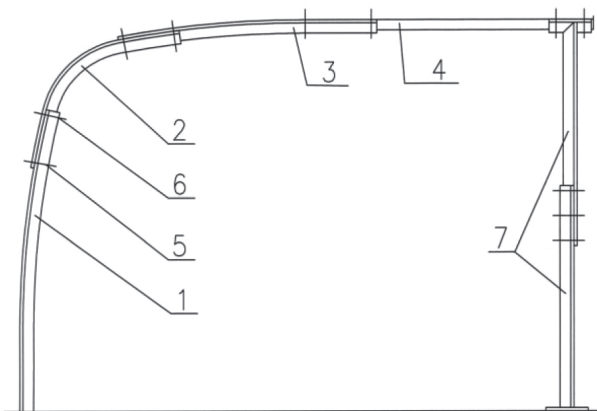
ŁPro/A frame: 1 – side section, 2 – upper side section, 3 – top section, 4 – straight top section, 5, 6 – shackles, 7 – prop (supporting element)
